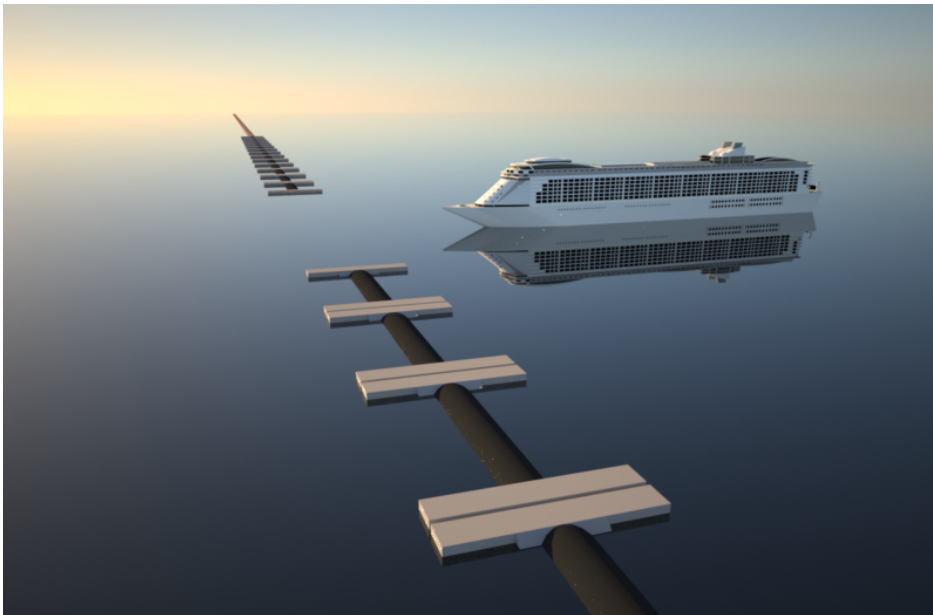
IMPRESSION DRAWING, SIDE VIEW
